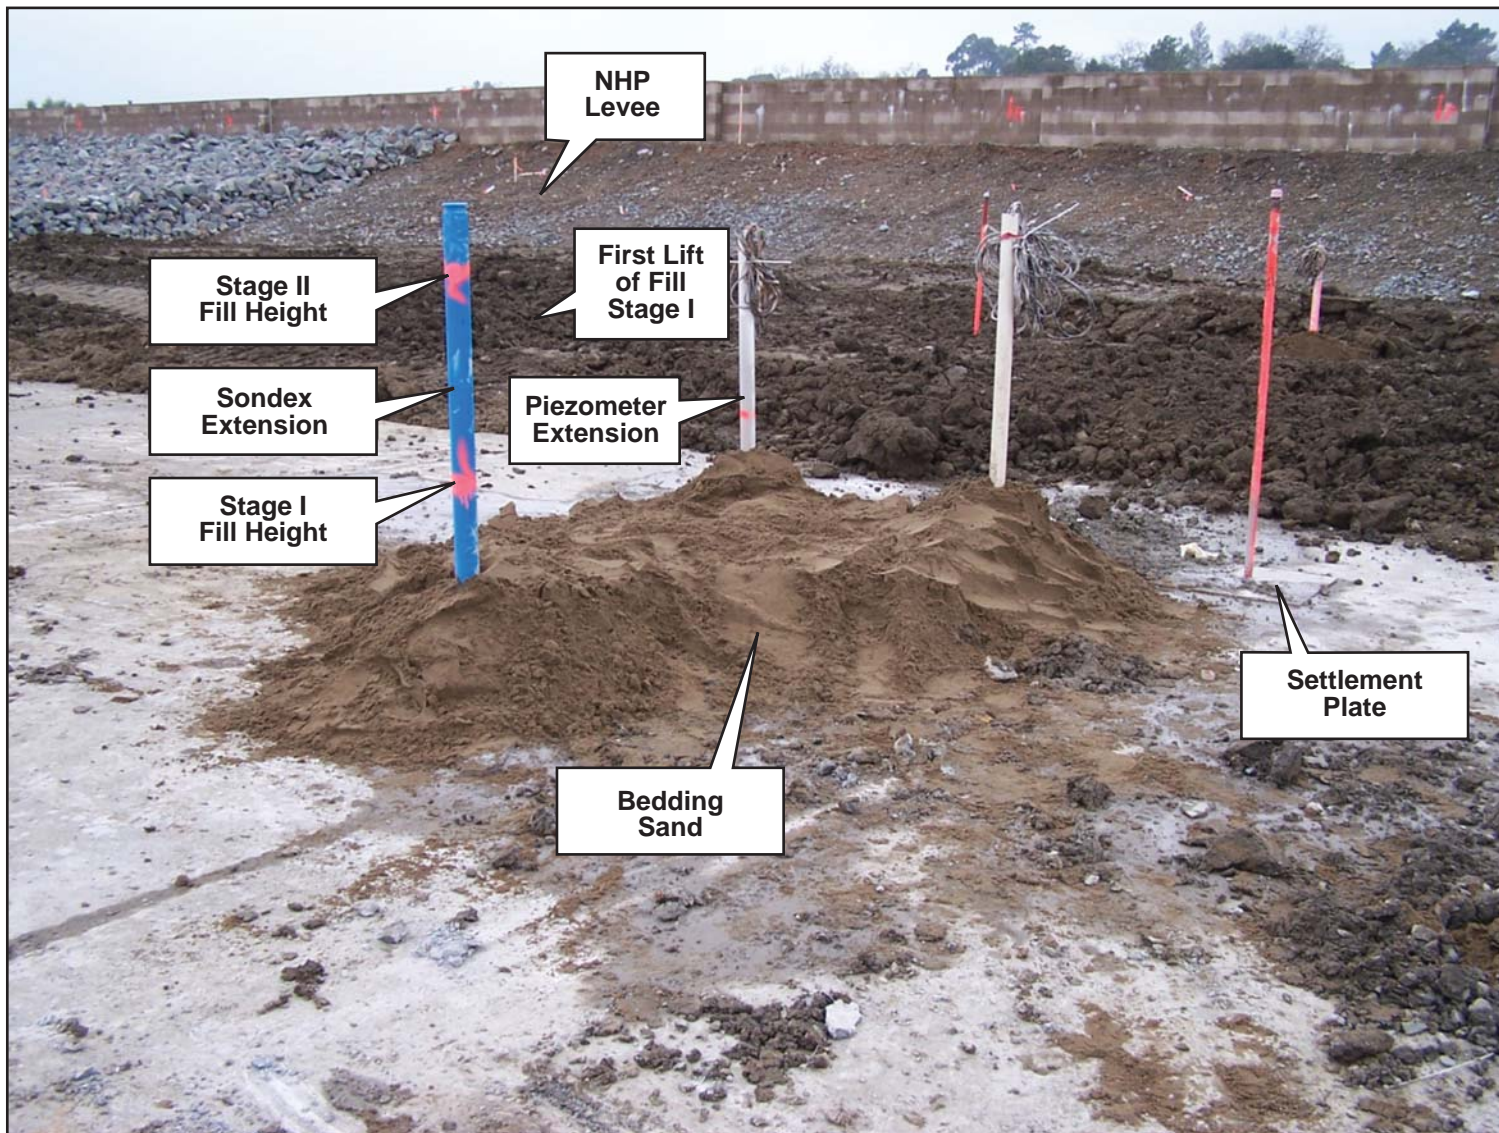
Instrumentation Layout for the Hamilton Test Fill
